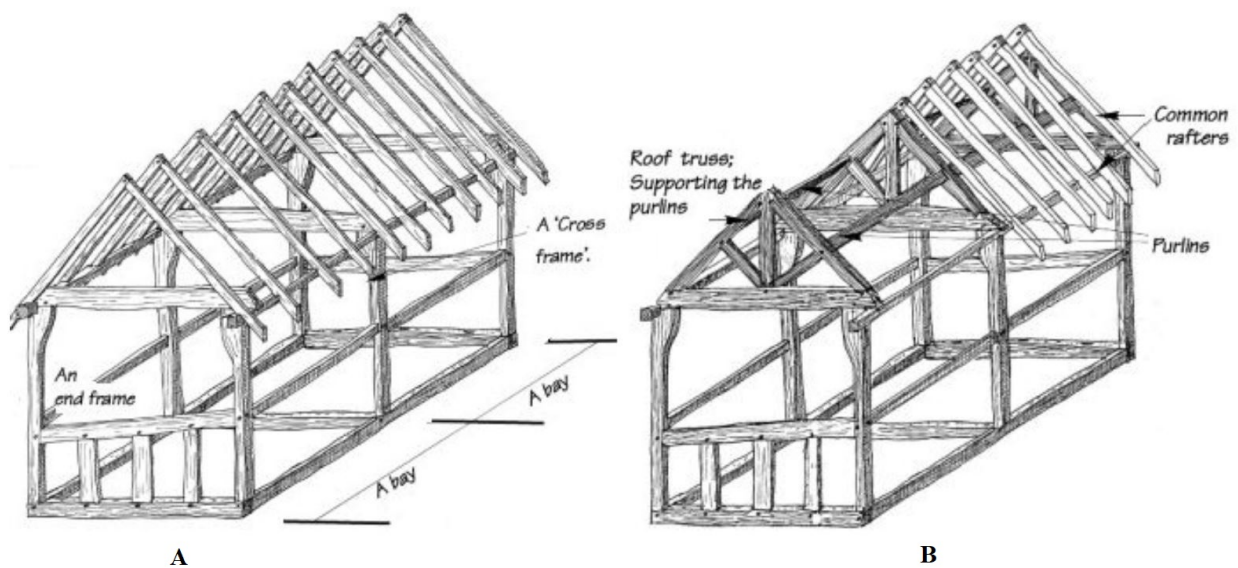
A) Box Frame construction, B) Post and Truss construction [10]
